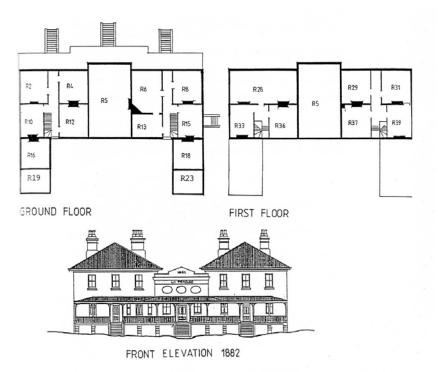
Ground and first floor plans and elevation of the Cable Station building c.1882. (Presented in NSW PWD 1987: 17)
